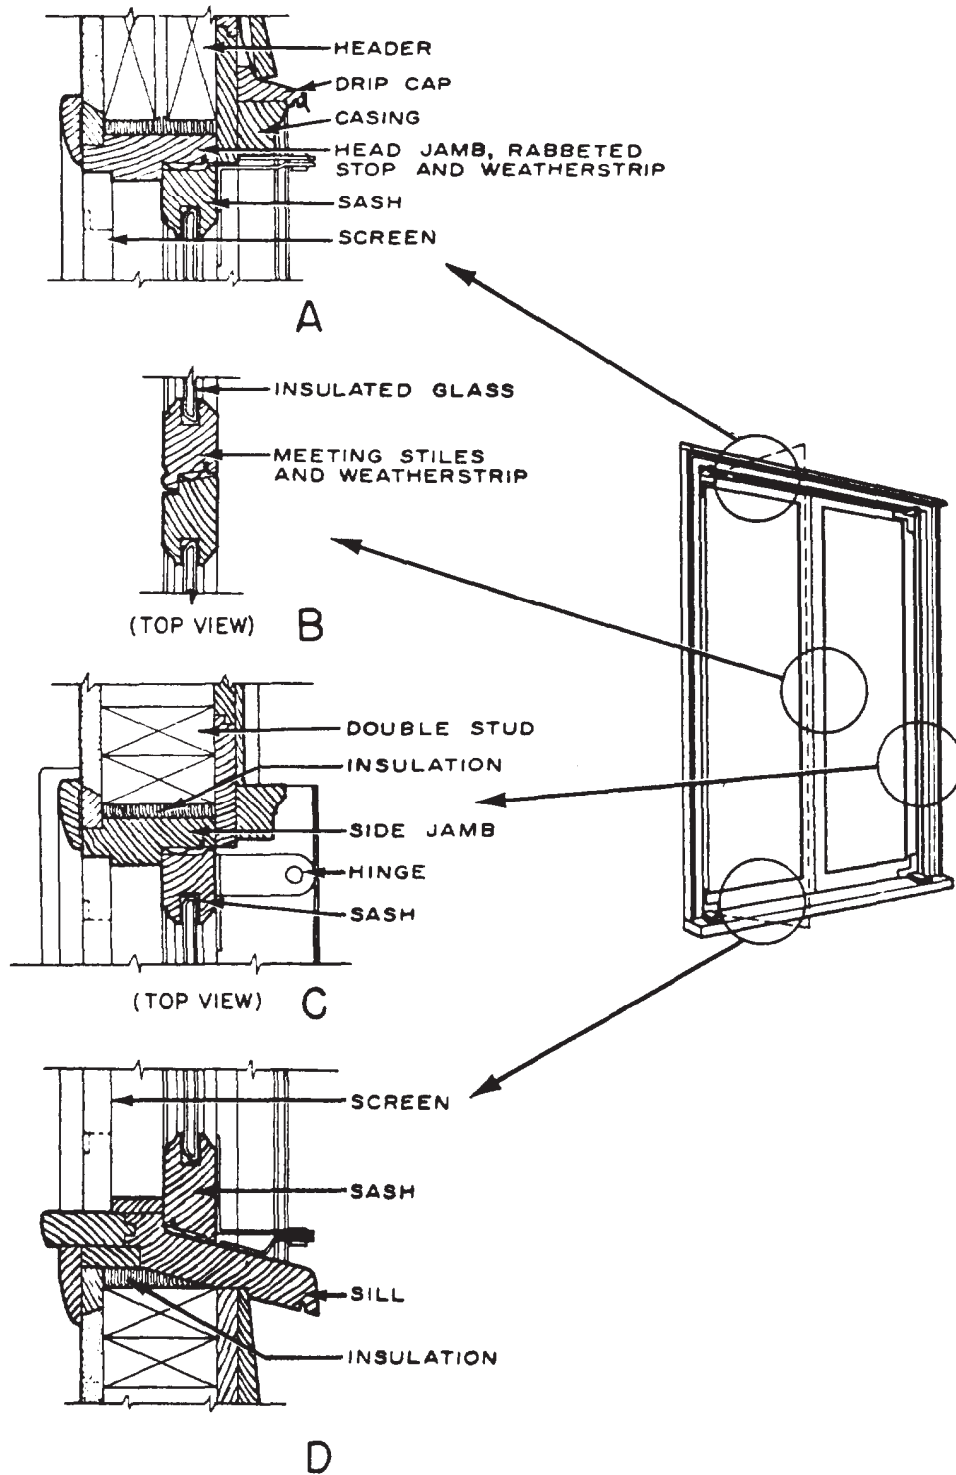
Outswinging casement sash. Cross sections: A. Head jamb; B. Meeting stiles; C. Side jambs; D. Sill.
